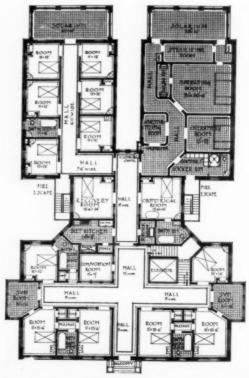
Baker Sanatorium, Charleston, S. C. Third floor plan.
